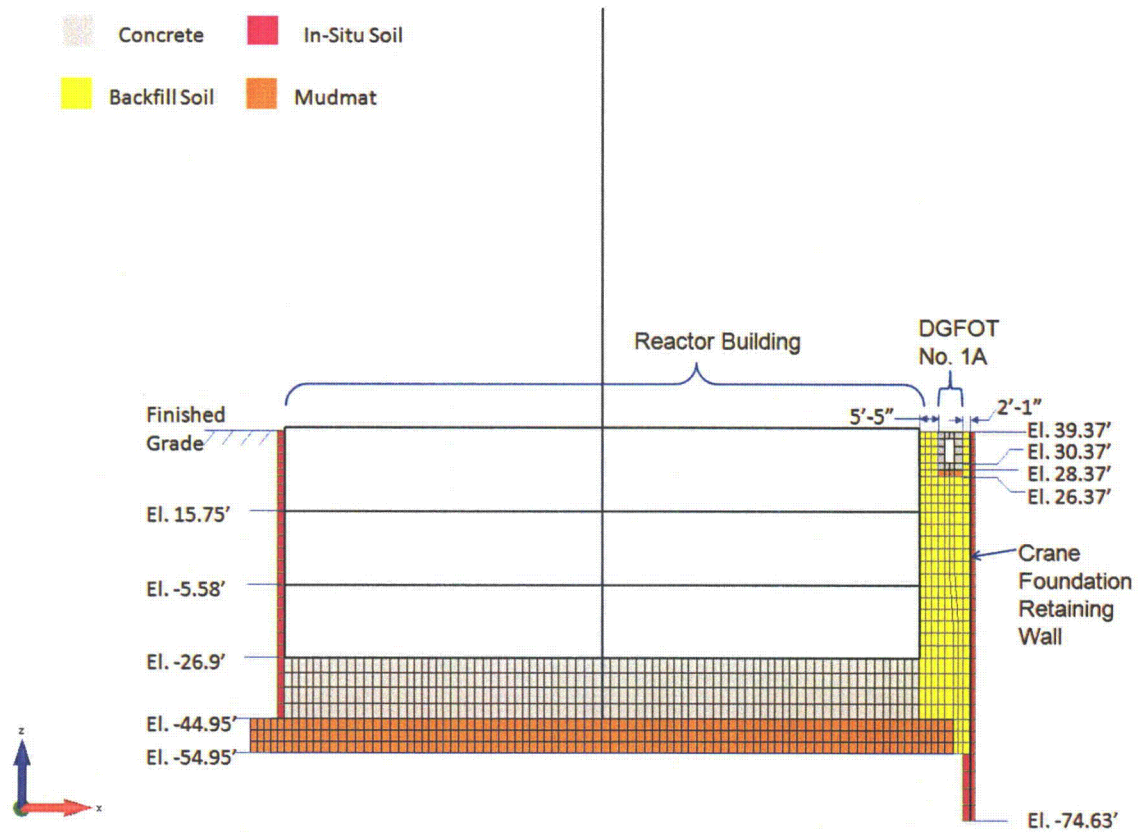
H.7-21: 2D SSSI Model of RB, DGFOT and Crane Foundation Retaining Wall
